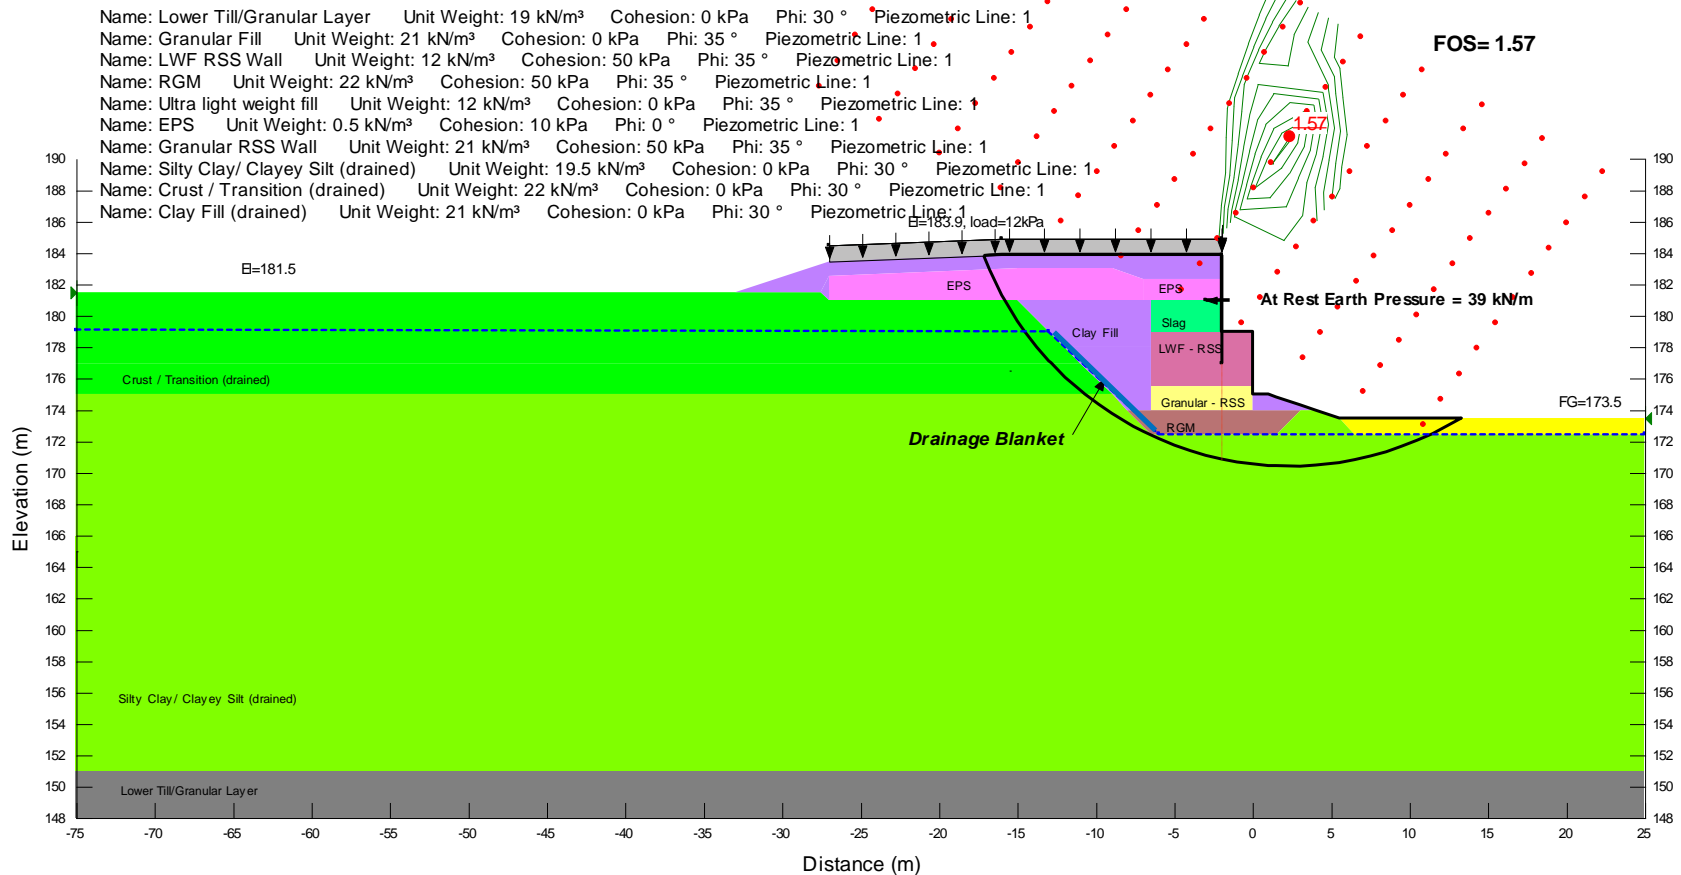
Slope Stability – Short Term – North Abutment - Station 10+450L Hwy 401
